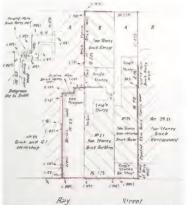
Survey Plan of Nos. 37 and 39 Bay Street, 1975
